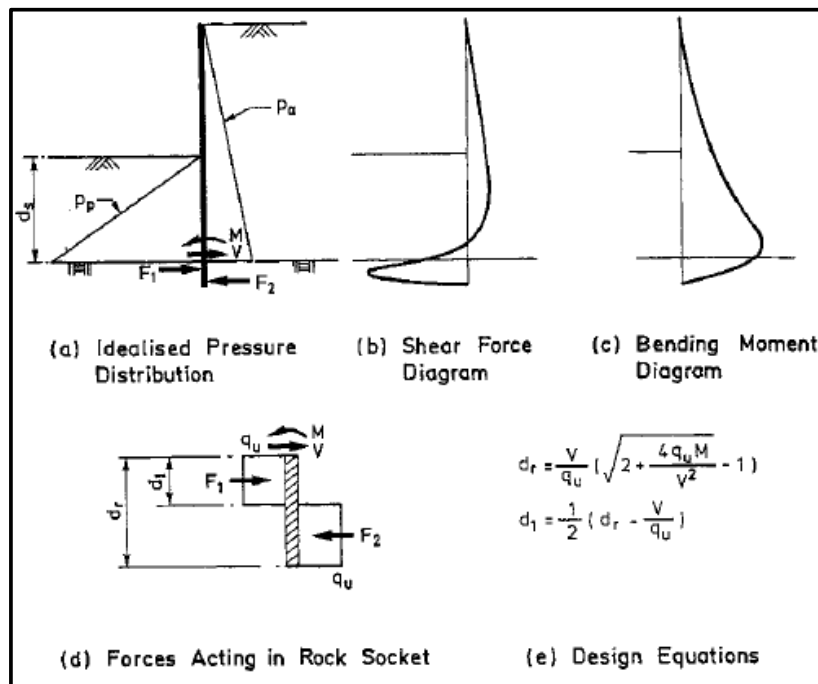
Design of rock socket against bearing failure for the case where the top of the socket is below the point of zero shear (GEOCEDHG, ,1993)
